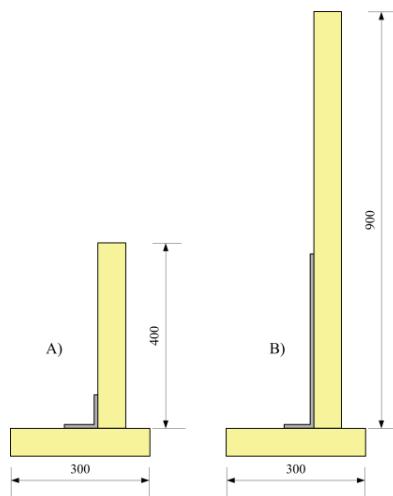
A) dimensions of the specimen of series 1, 2 and 3; B) dimensions of the specimen of series 4.
